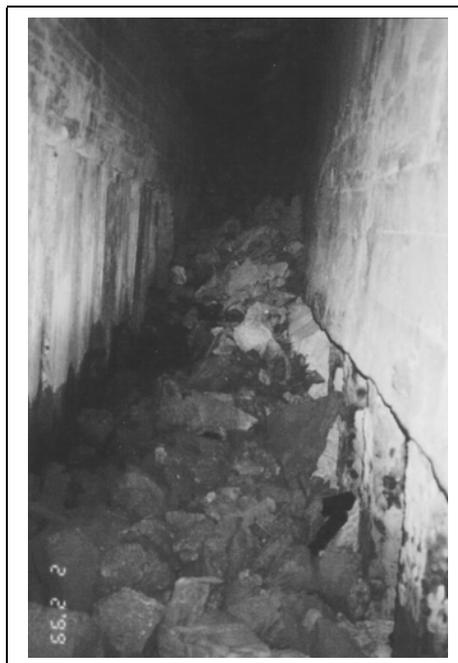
Void beneath Berth 10. To the left are concrete sheet piles and beyond the harbour. To the right of the void are more recent steel sheet piles. Since the time of driving the steel sheet piles the large void has developed.
